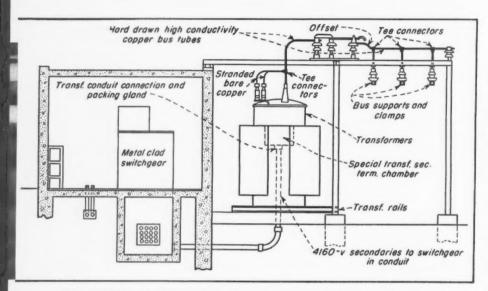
MAIN SUBSTATION combines outdoor 26.4-kv/4160-v oil-insulated transformers with indoor metal-clad switchgear. Cable connections between primary transformers and switchgear are carried through underground conduit runs and walk-through cable vault.
